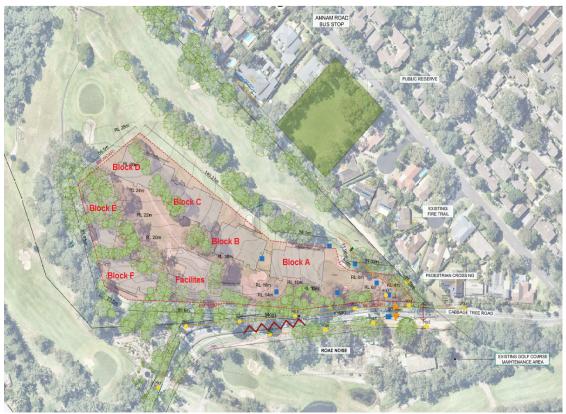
Proposed building arrangement (Source: Adapted by the author from Plan 'Site Analysis 03' – Revision A, prepared by Marchese Partners)
